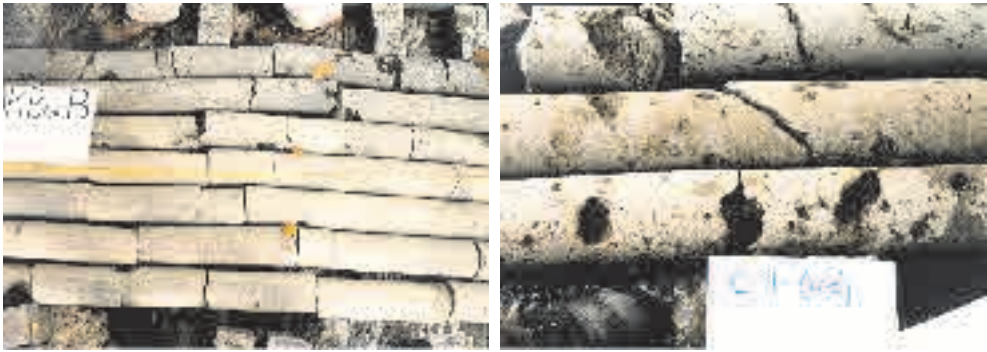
Cores taken from Jet Grouted Sand Column B (left) and Jet Grouted Peat Column C (right)
